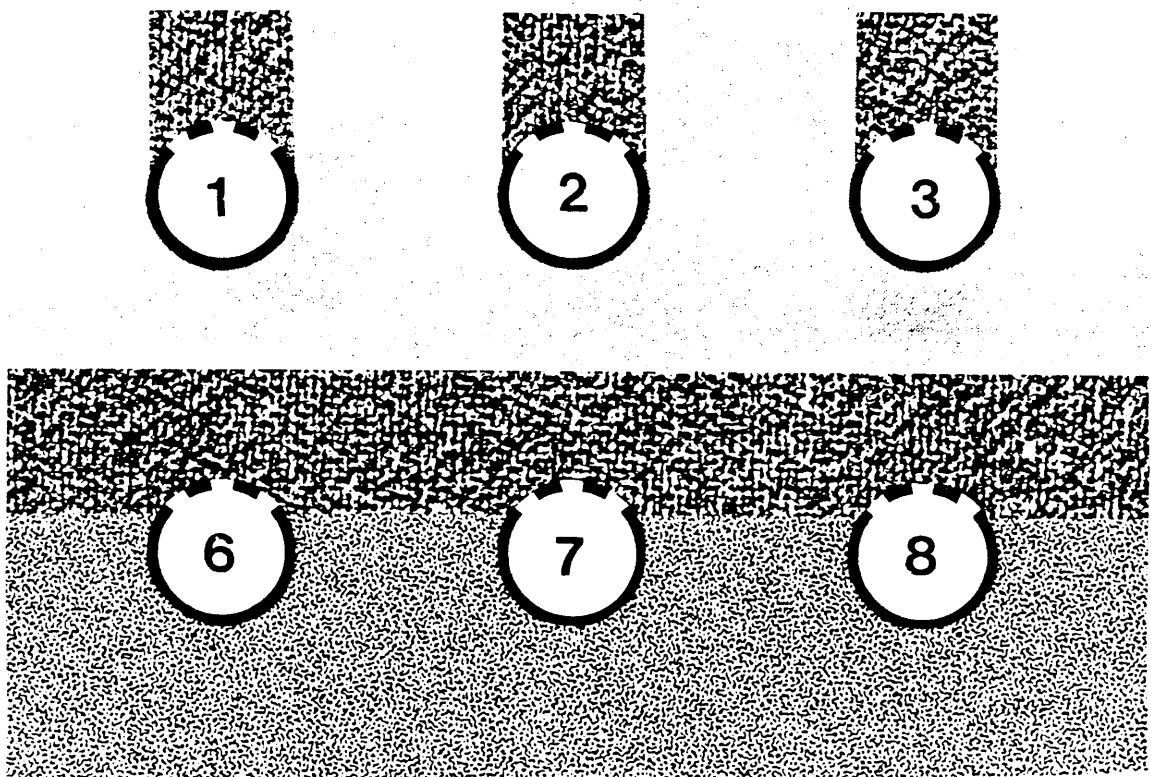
Side elevation of soil profile drains detailing drainage holes and permeable gravel layers.
